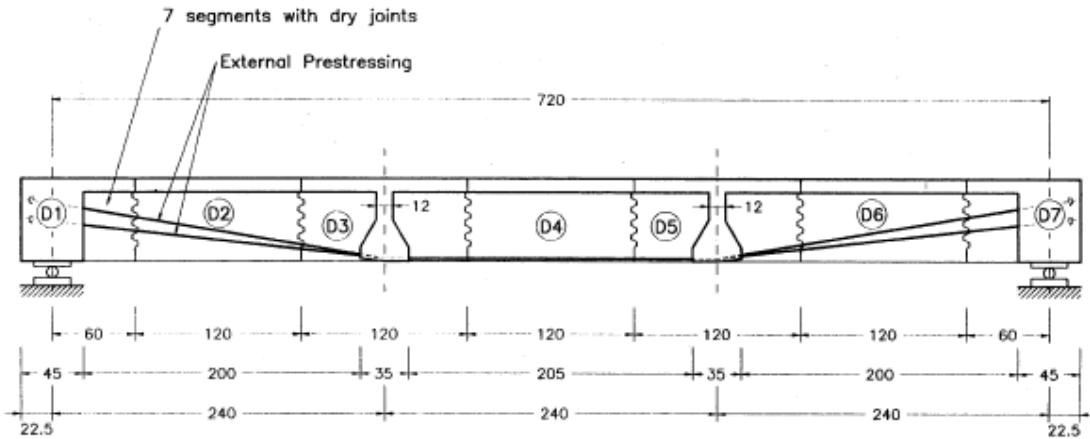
Elevation View of Segmental Girder Tested by Aparicio (2001)
